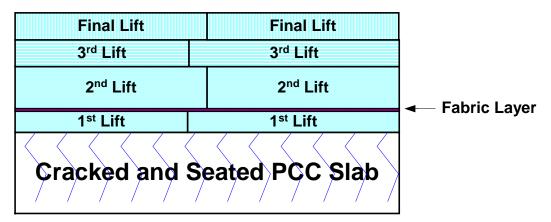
Overlap of longitudinal joints on multi-lift AC paving of adjacent lanes.
